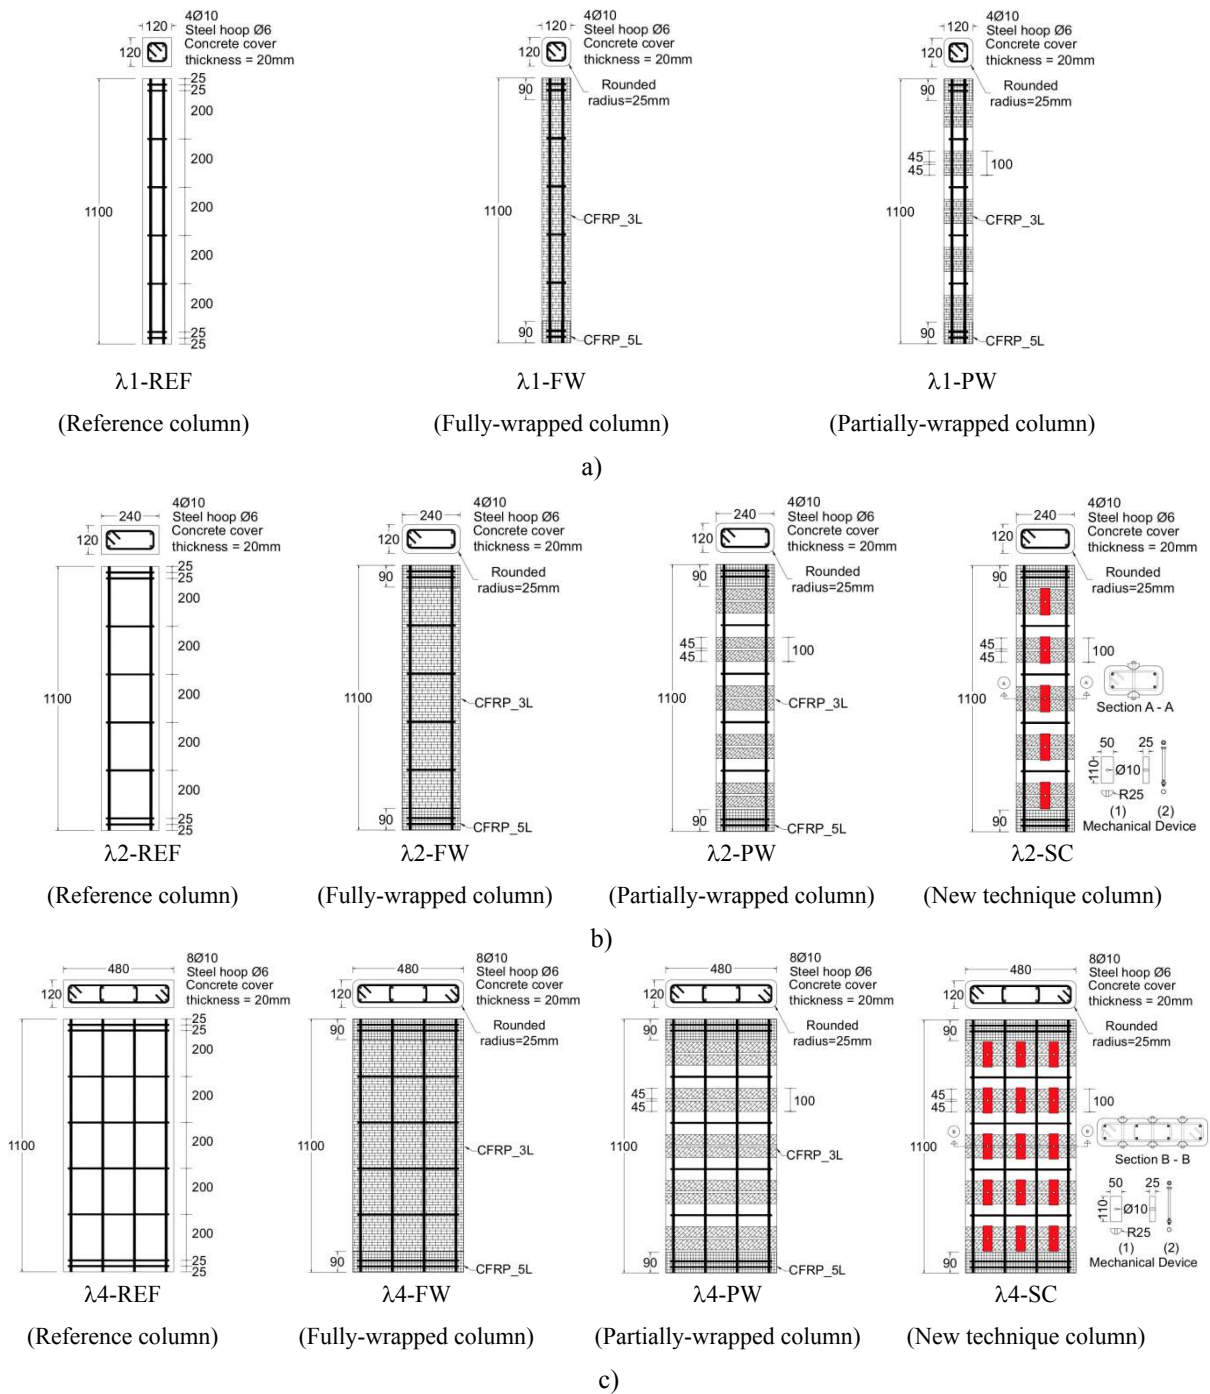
Geometry, reinforcement, and strengthening configuration for the series of RC columns with cross-sectional aspect ratio of: a) 1; b) 2; and c) 4 (dimension in mm)
